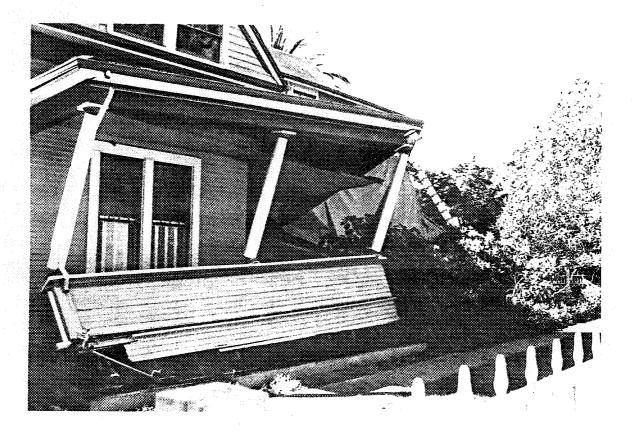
Collapsed Cripple wall and porch in the residence at Main Street in Los Gatos
